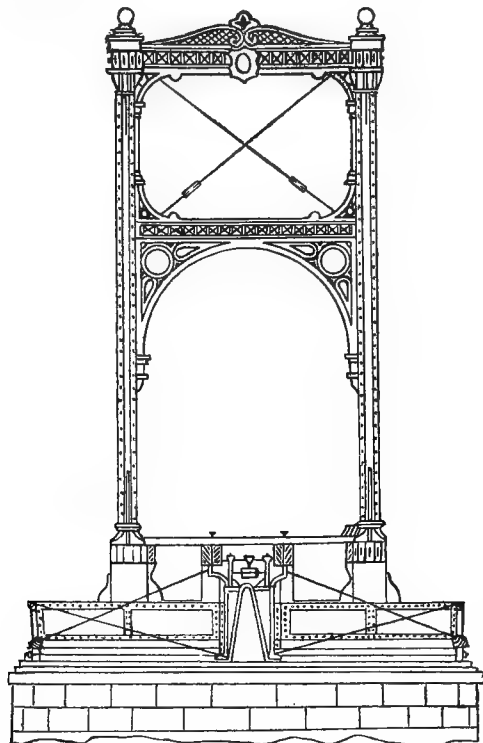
End Elevation and Section of Centre Pintle of Pivot Bridge over the Raritan River, N. J.
